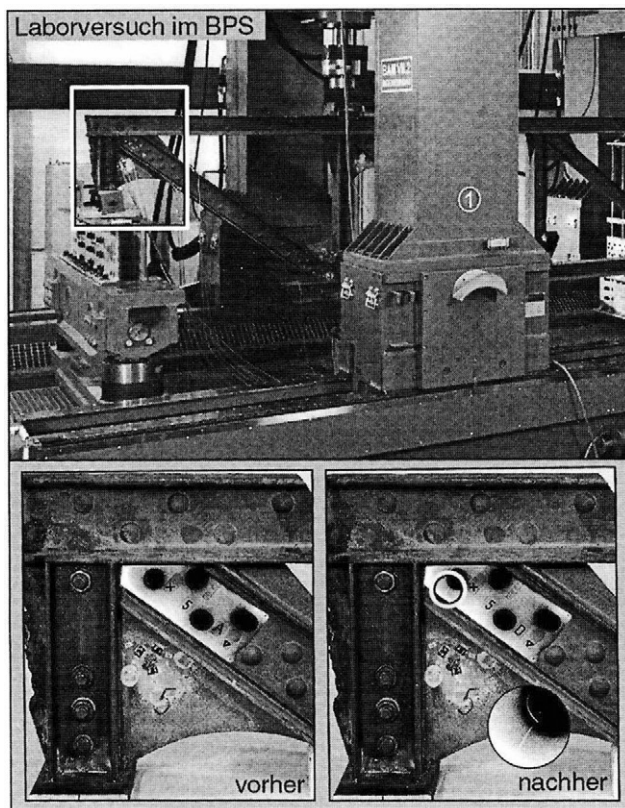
Equipment for radiographic inspection applied in the testing hall of BAM on a dismantled truss girder. Above: Part of the testing arrangement. Below: Photographic trick shots with films of radiographic inspection fastened to the bridge taken before the test and after a crack had occurred.
